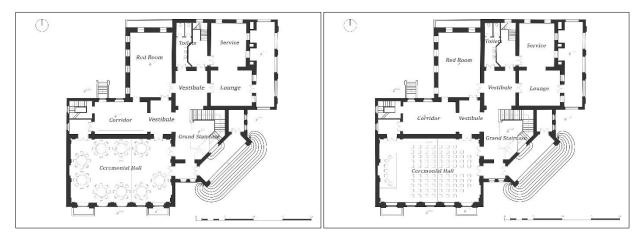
Second Scenario Ground floor plan First Alternative (left) and (right) Second Alternative (© Dorel Habili).
